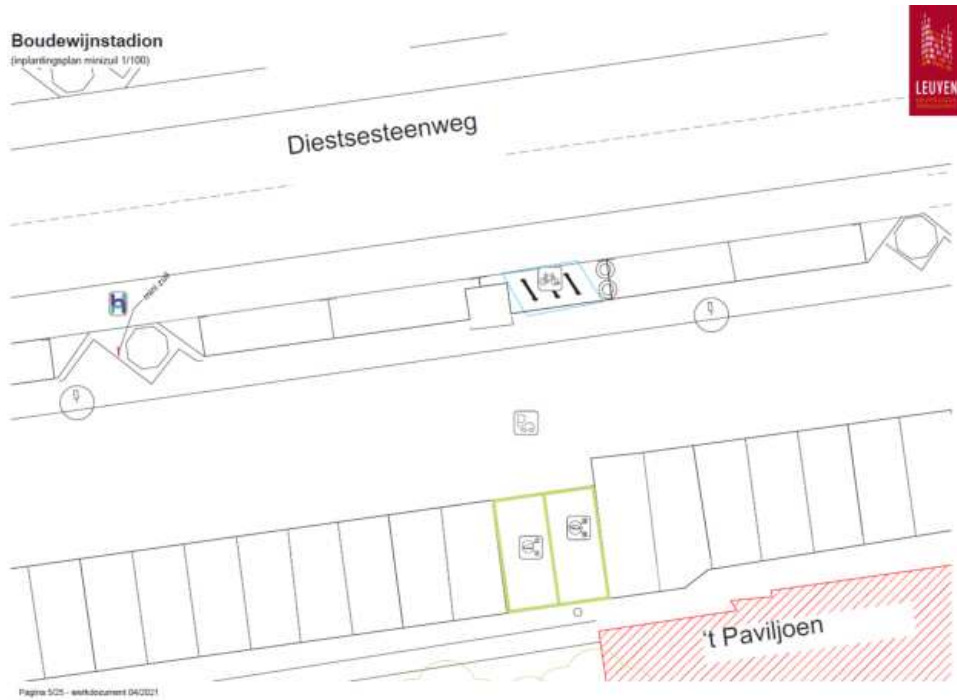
June 2021 – Site plan information pillar of eHUB Boudewijnstadion, implemented since June 2021
